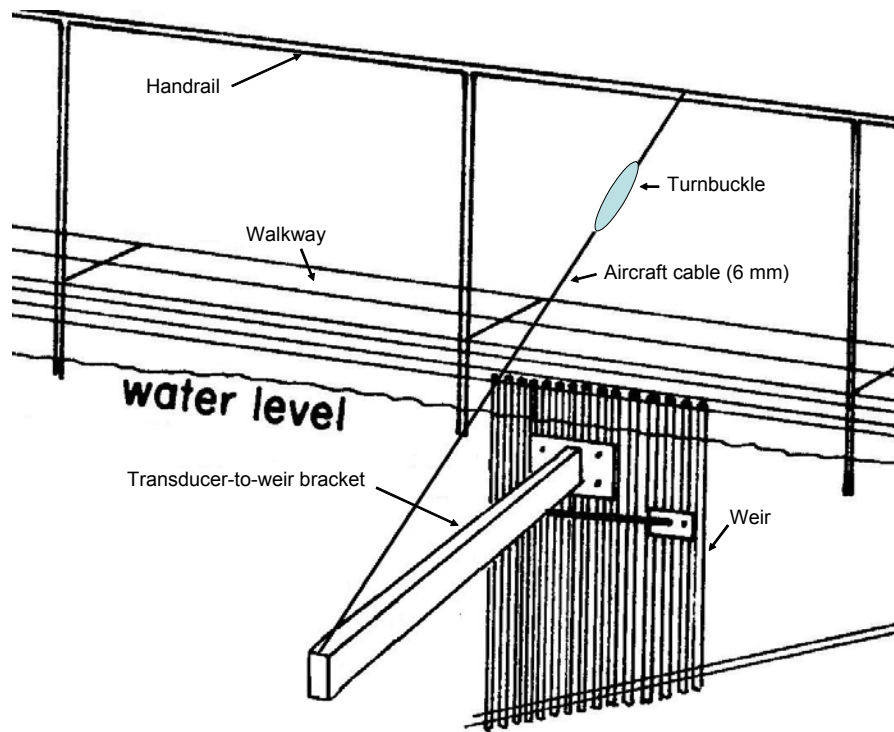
Three-dimensional view of the transducer-to-weir bracket mounted to the shore end of a fish deflection weir which has walkway access along its length. The galvanized aircraft cable gives guy line support by tightening the turnbuckle.
